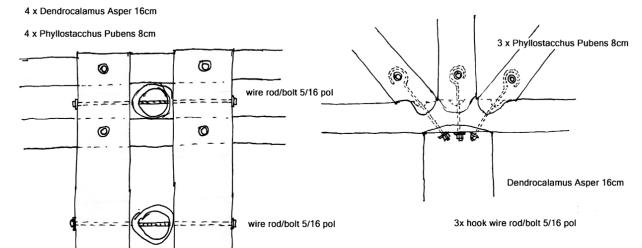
Schematic drawing of a Vierendeel and fish mouth connection.
